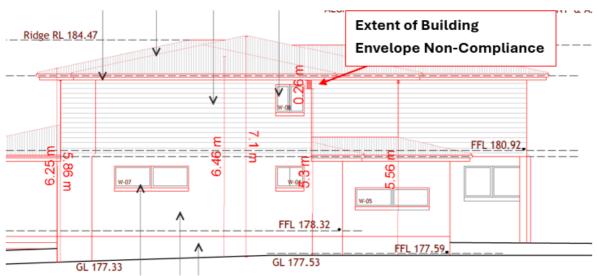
Extent of Building Envelope Non-Compliance on North-Eastern Elevation
